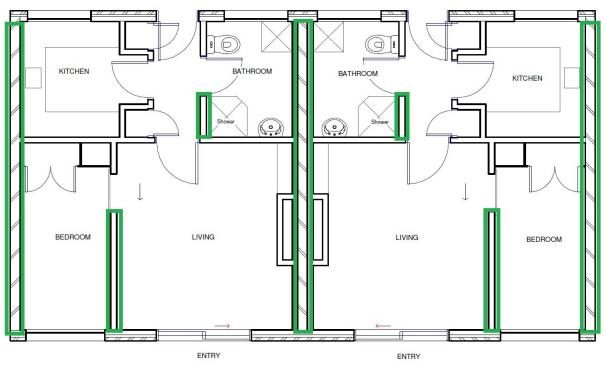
Walls used for bracing in the transverse direction (Units 1-25).
